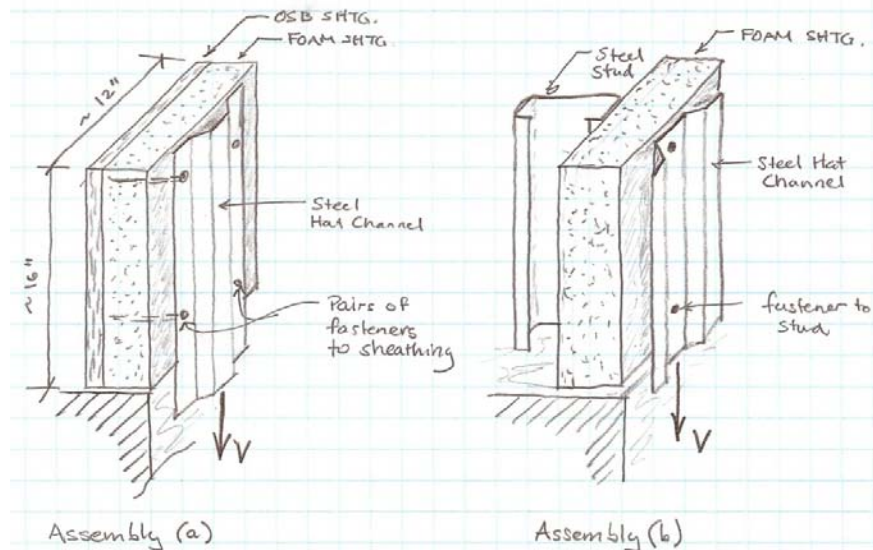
Steel Hat Channel Assembly Shear Test Configurations
